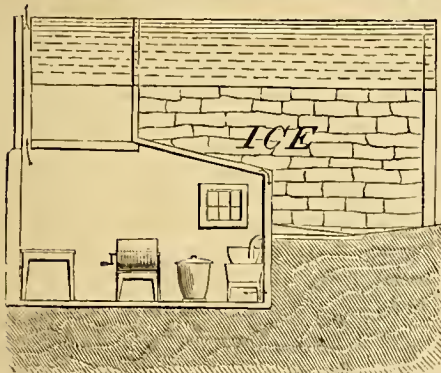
SECTION OF ICE-HOUSE AND DAIRY.
